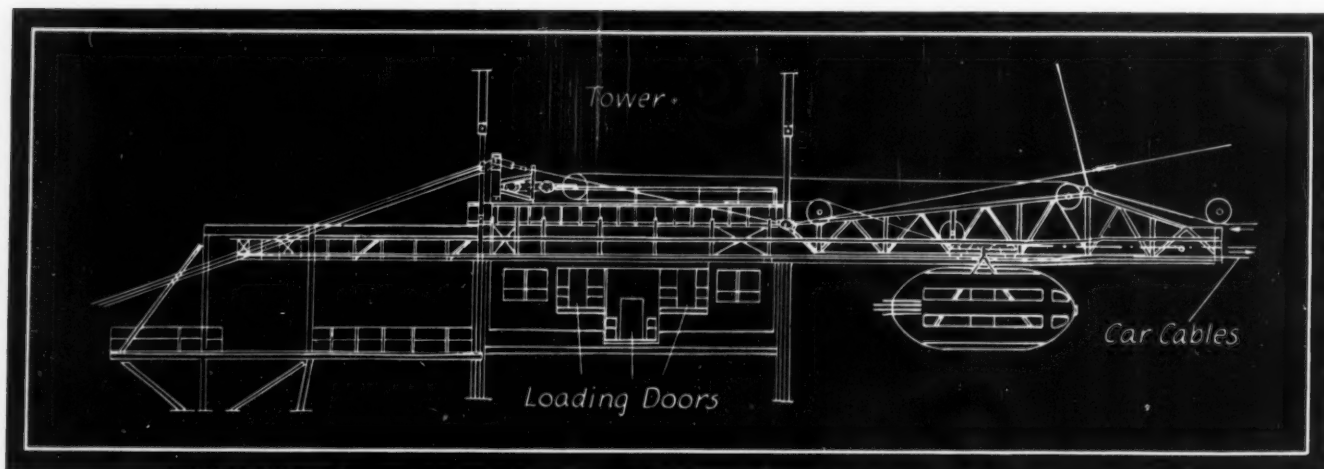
Elevation of tower shows car about to leave steel track and pass on to cables
